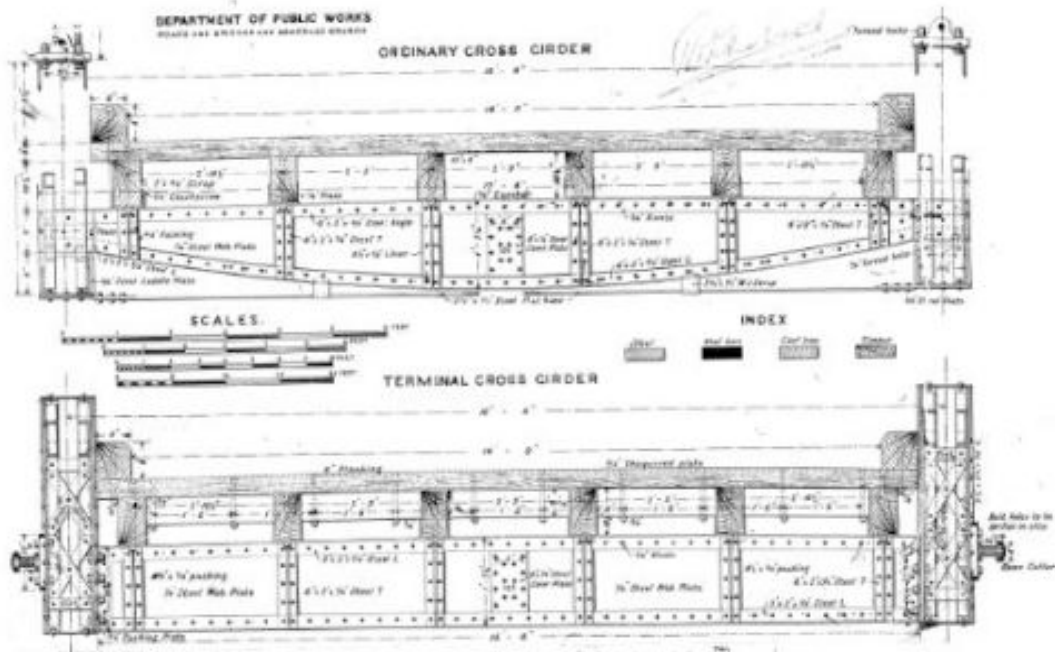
Cross sections of the Swan Hill Bridge lift span
